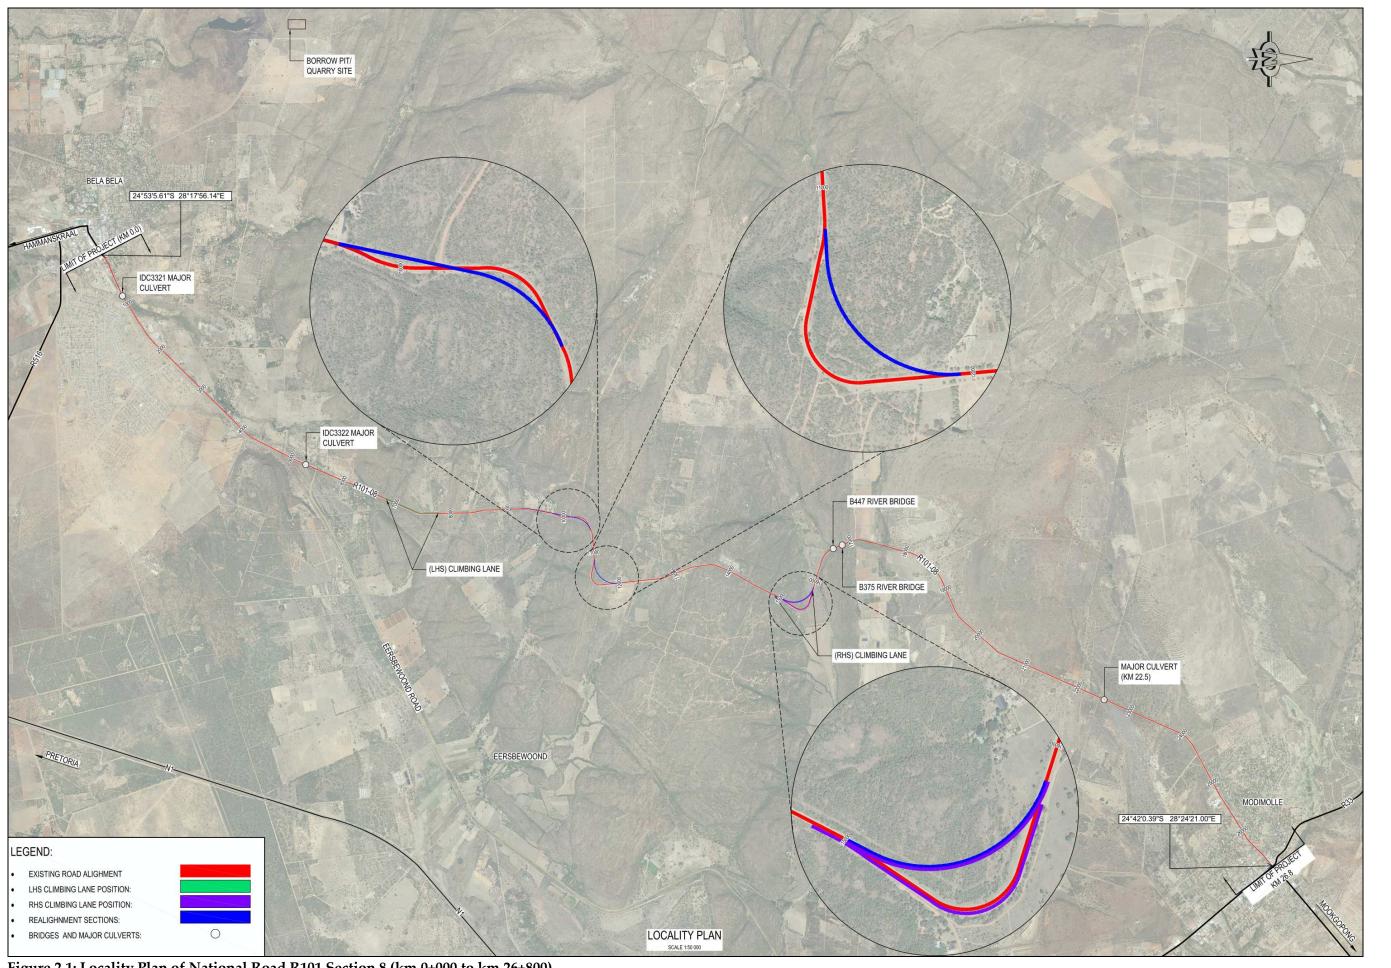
Locality Plan of National Road R101 Section 8 (km 0+000 to km 26+800)
